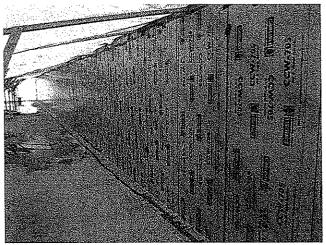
Air barrier membrane installation started on the north elevation of segment F. January 7, 2011.
